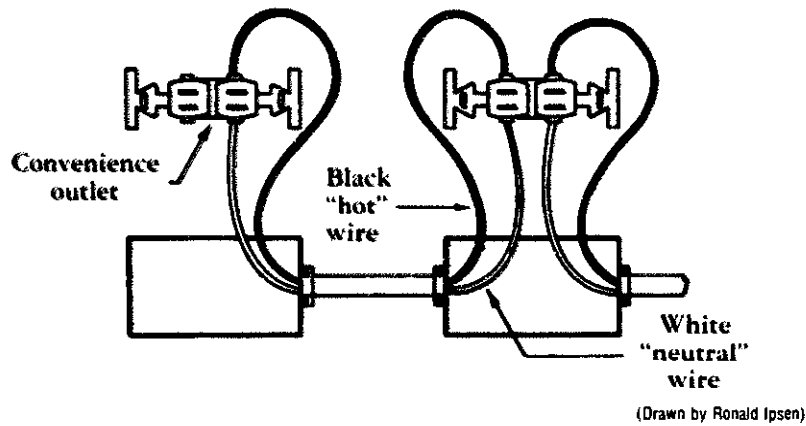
The addition of a convenience outlet beyond an existing outlet. For clarity, the grounding wire is not shown.
